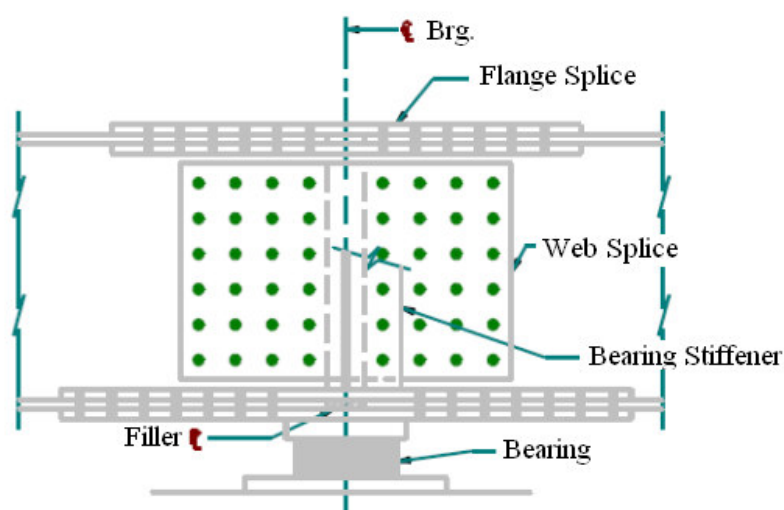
Details of Continuous Retrofit for MSSS Bridge.
